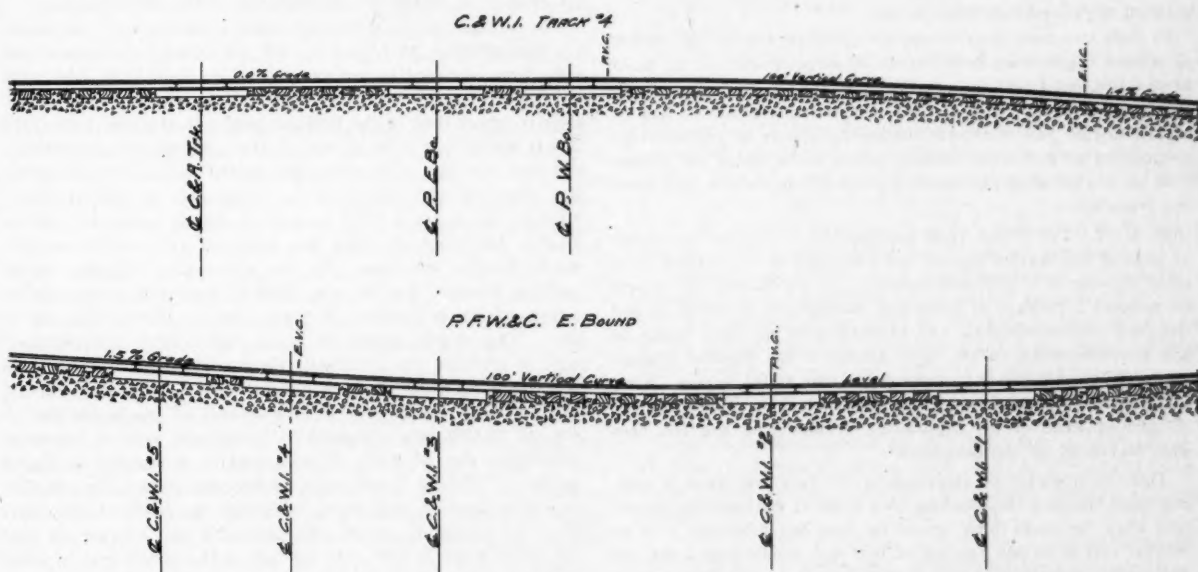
Detail Drainage Plan and Section for Crossings, 21st St., Chicago, C. & W. I. R. R.
